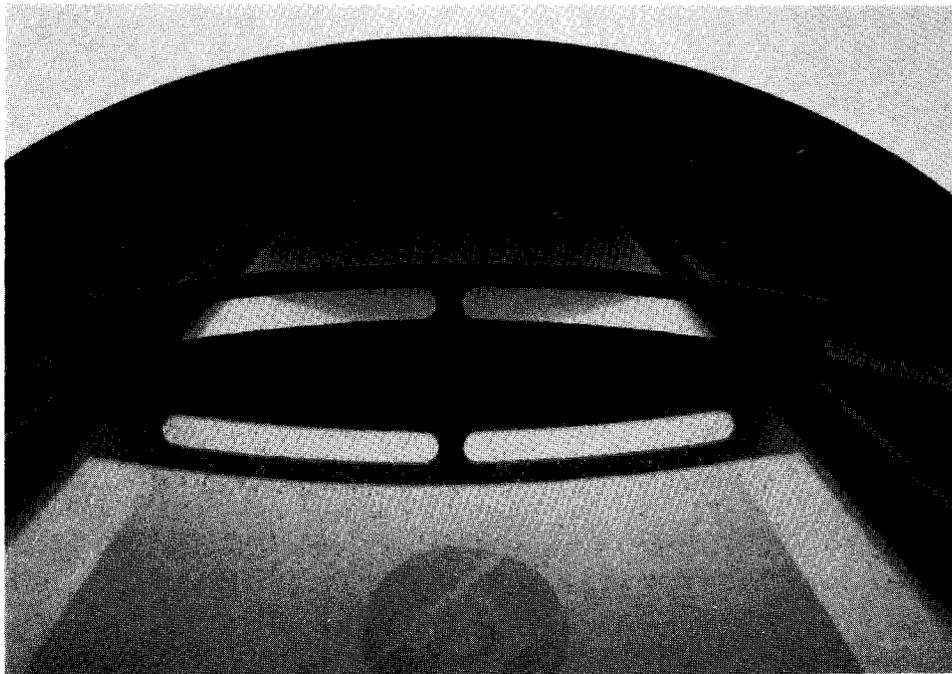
Tower, detail of handrail along horizontal mullion of Lantern Gallery window wall.
